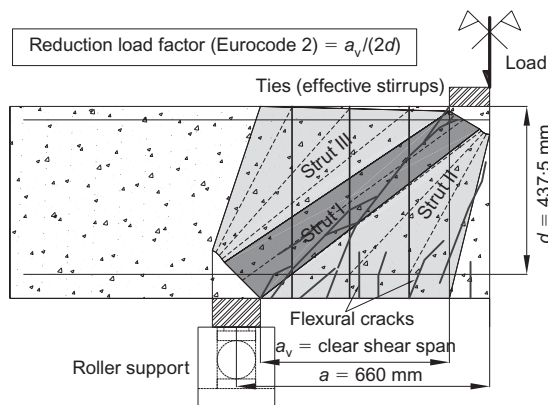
Typical crack pattern and load paths in a short span beam $1 < a_v/d < 2$ with stirrups (beam AL3, tested by the authors at Imperial College London)
